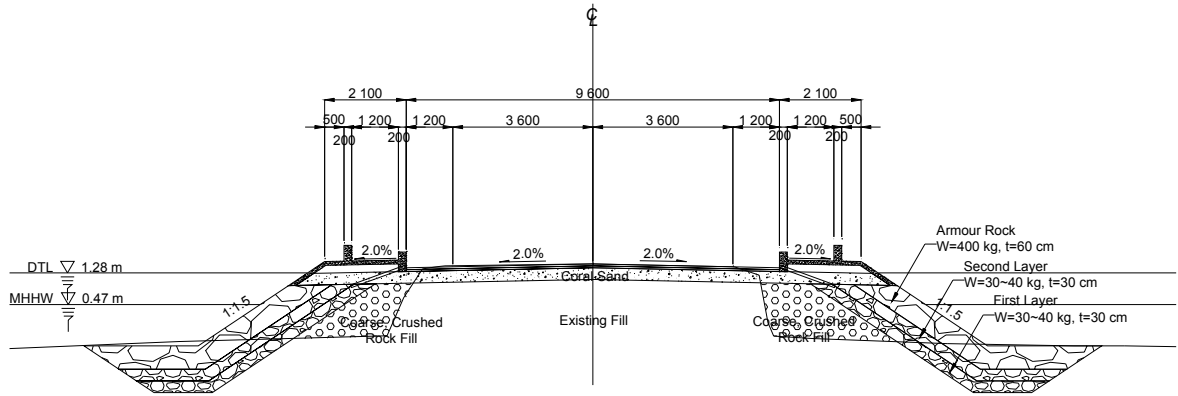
Malakal/Airai Causeway Typical Cross Section
